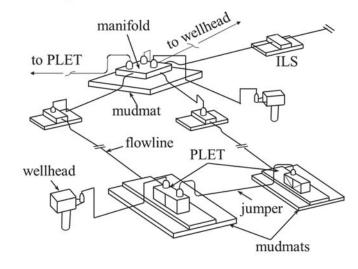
Schematic showing range of subsea structures supported on shallow foundations
